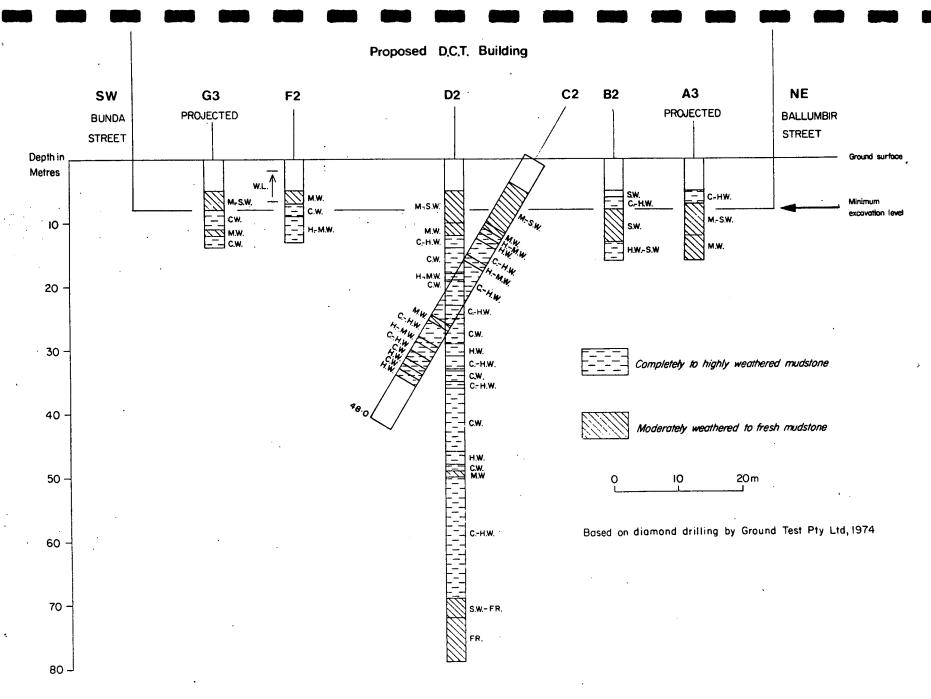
CITY EAST PROJECT, GEOLOGICAL SECTION THROUGH FOUNDATION OF D.C.T. BUILDING
